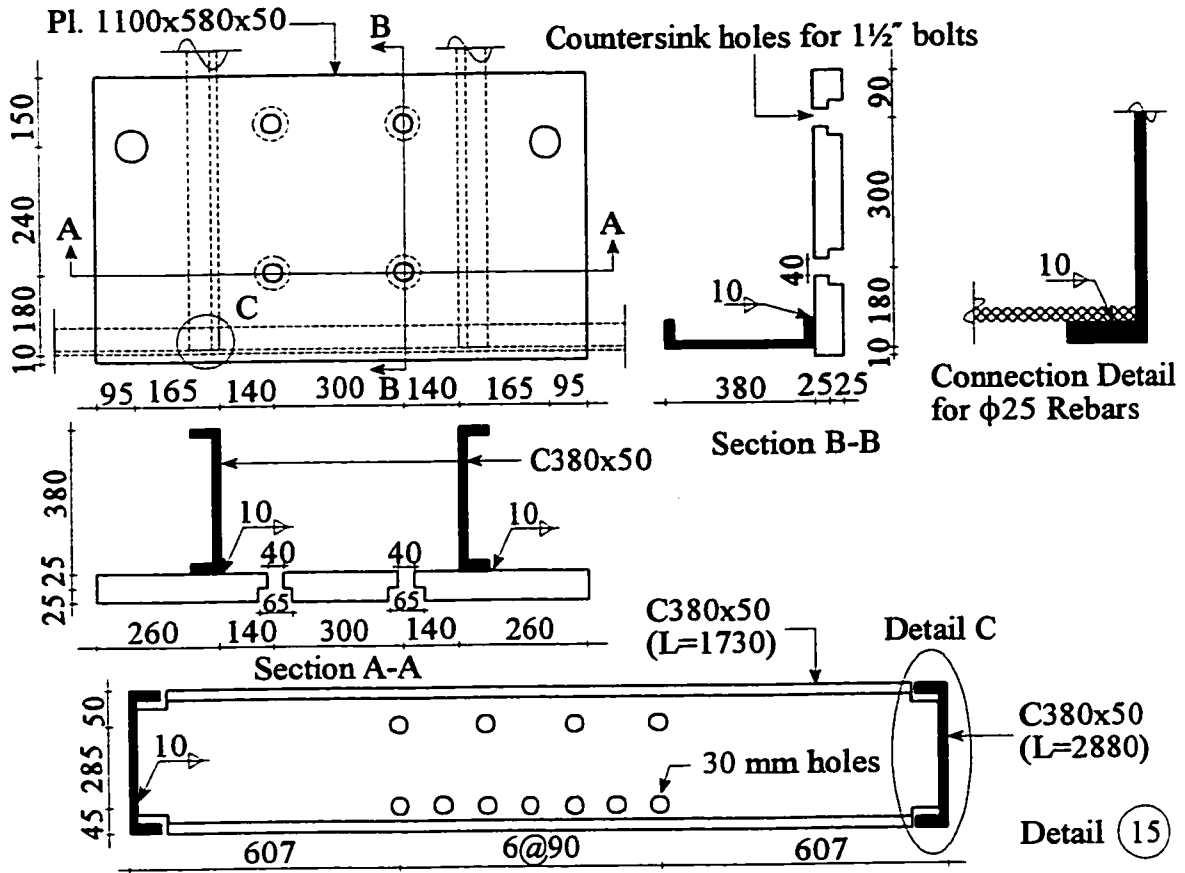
Details for holes and connections of base plates and channel sections in foundation.
